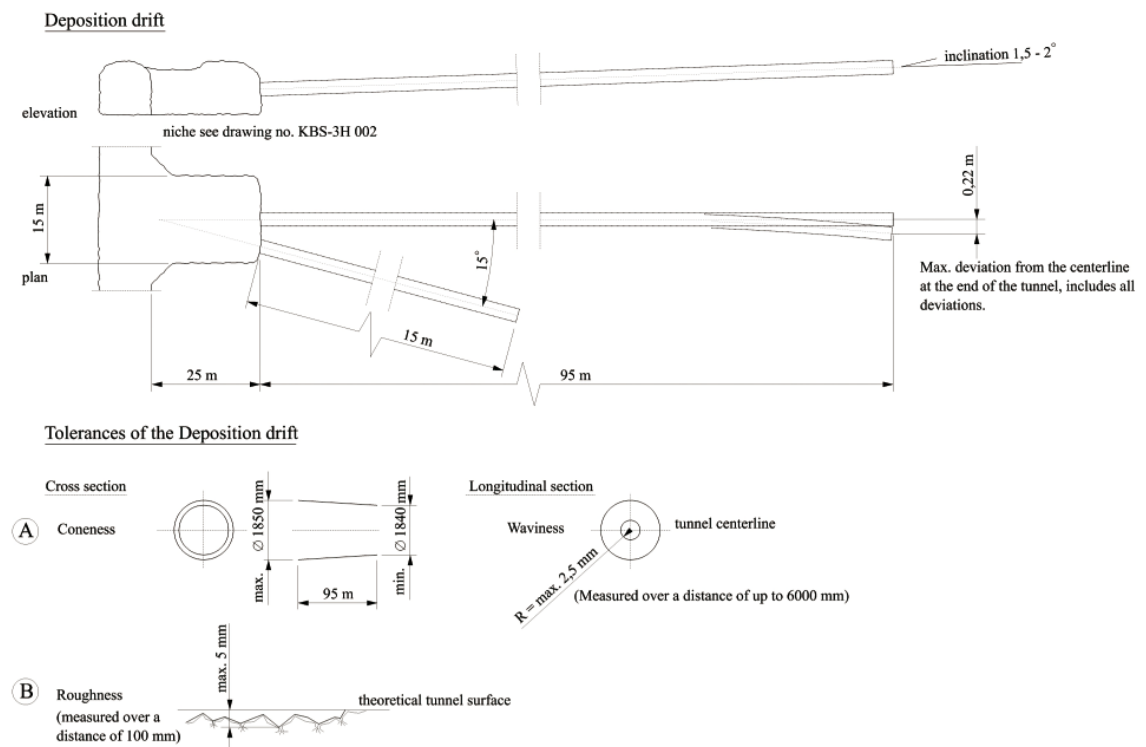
SKB requirements on geometrical tolerance for this field test.
